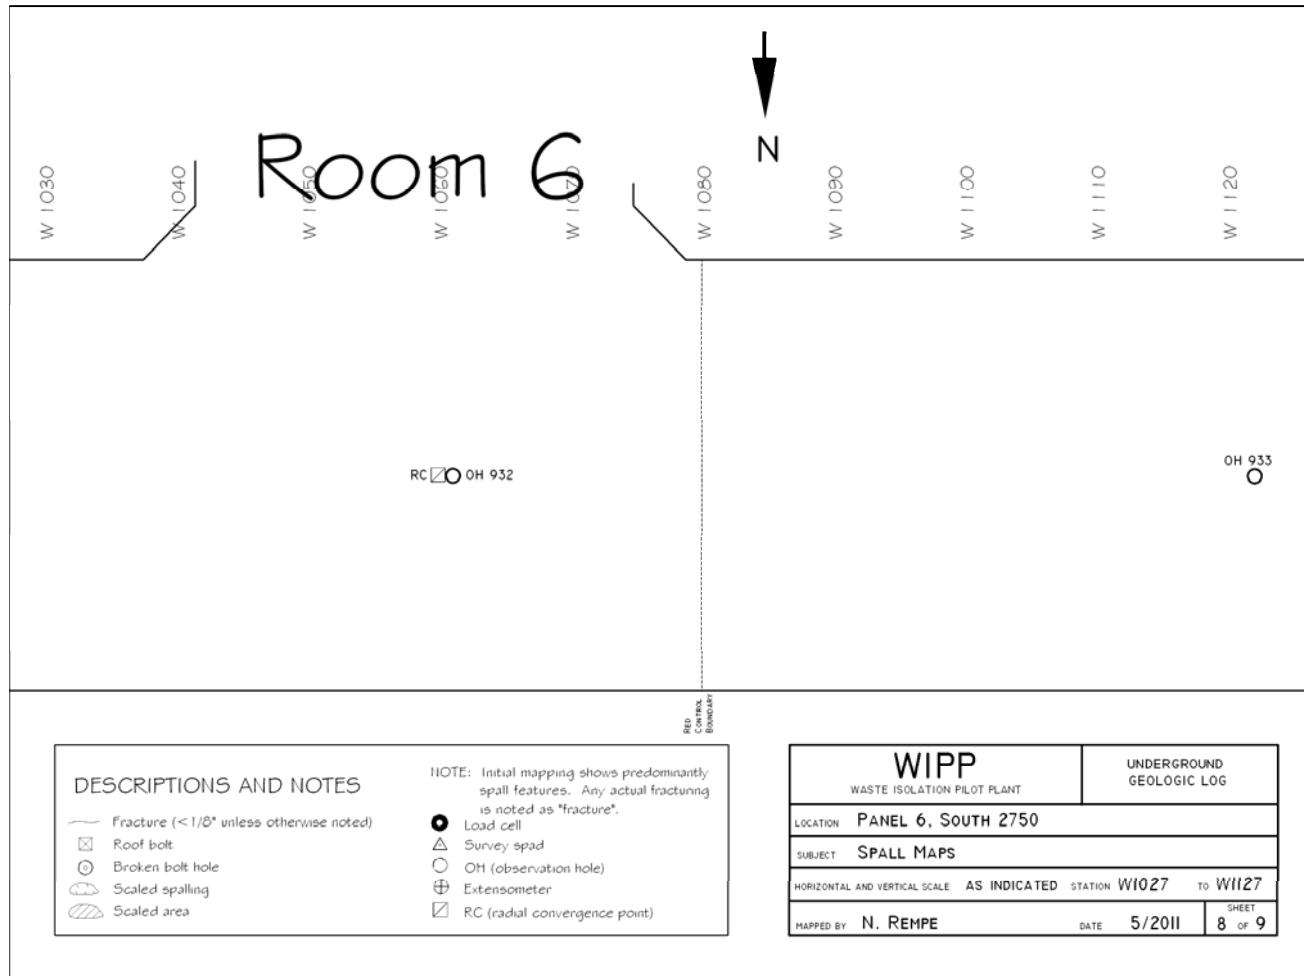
Panel 6 S2750, W390-W1210 Roof Fractures (Sheet 8 of 9)
